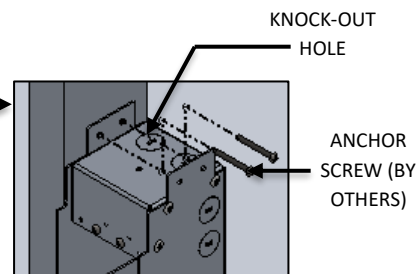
DETAIL SHOWING KNOCK-OUT HOLE AND SCREWS
